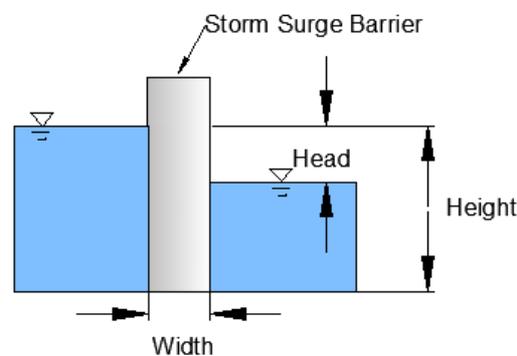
Simplified Storm Surge Barrier Cross Section
